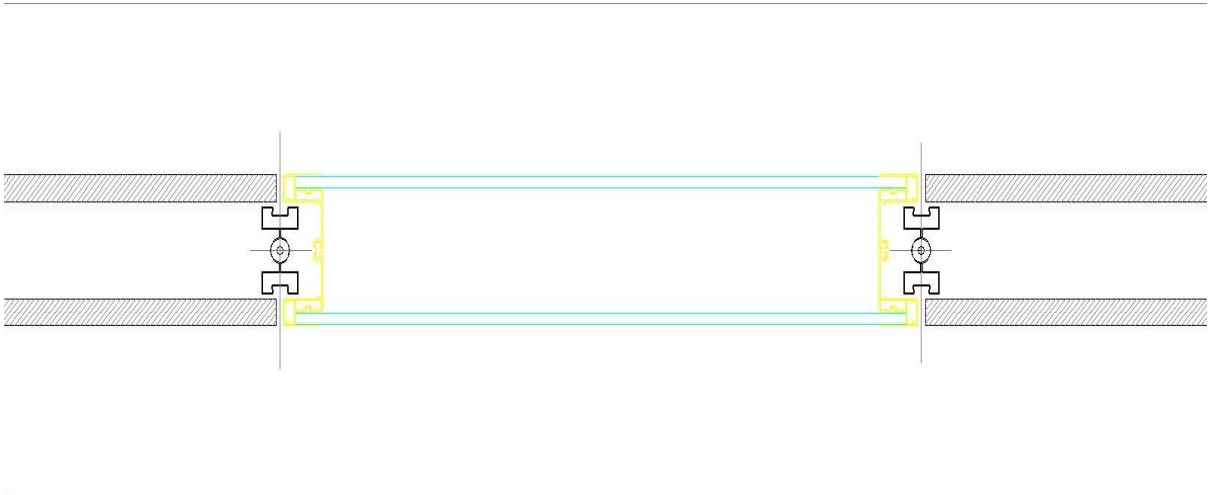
Junctions for two layers glass for window with structure and wall panel
